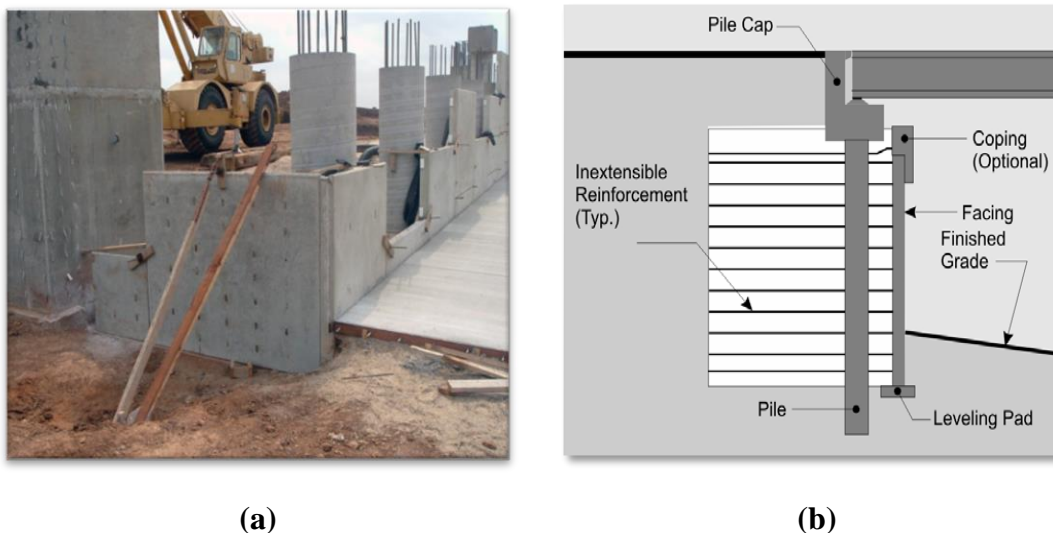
Drilled shafts within MSE wall: (a) construction of drilled shaft behind MSE wall, and (b) drilled shafts behind MSE wall supporting bridge abutment (After Anderson, 2005).
